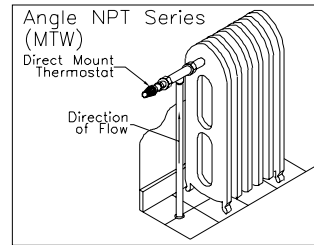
Typical Installation of Valve (Angle Body) on Radiator
